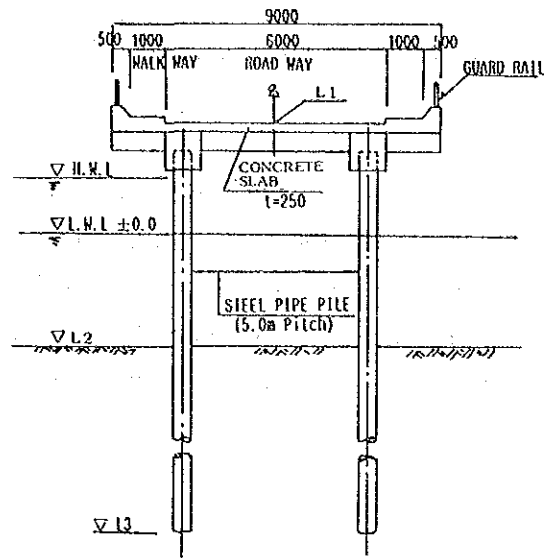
Layout of Mooring facilities of Saubeba Ferry Terminal
